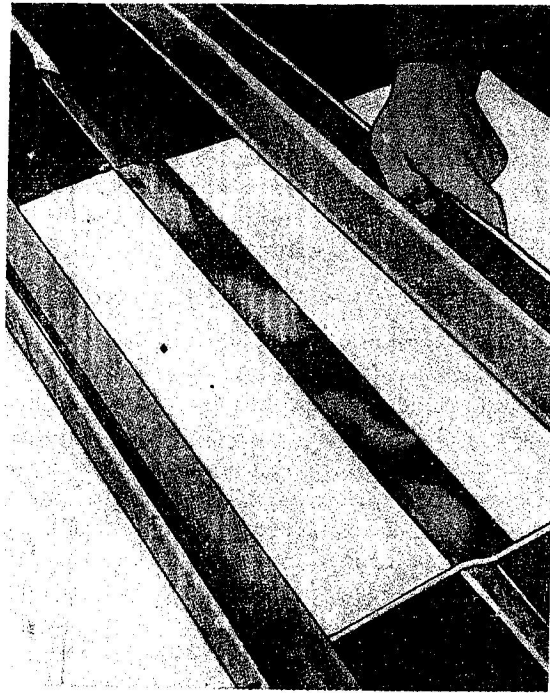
Heat Welded Joint With Lateral Pressure Applied
